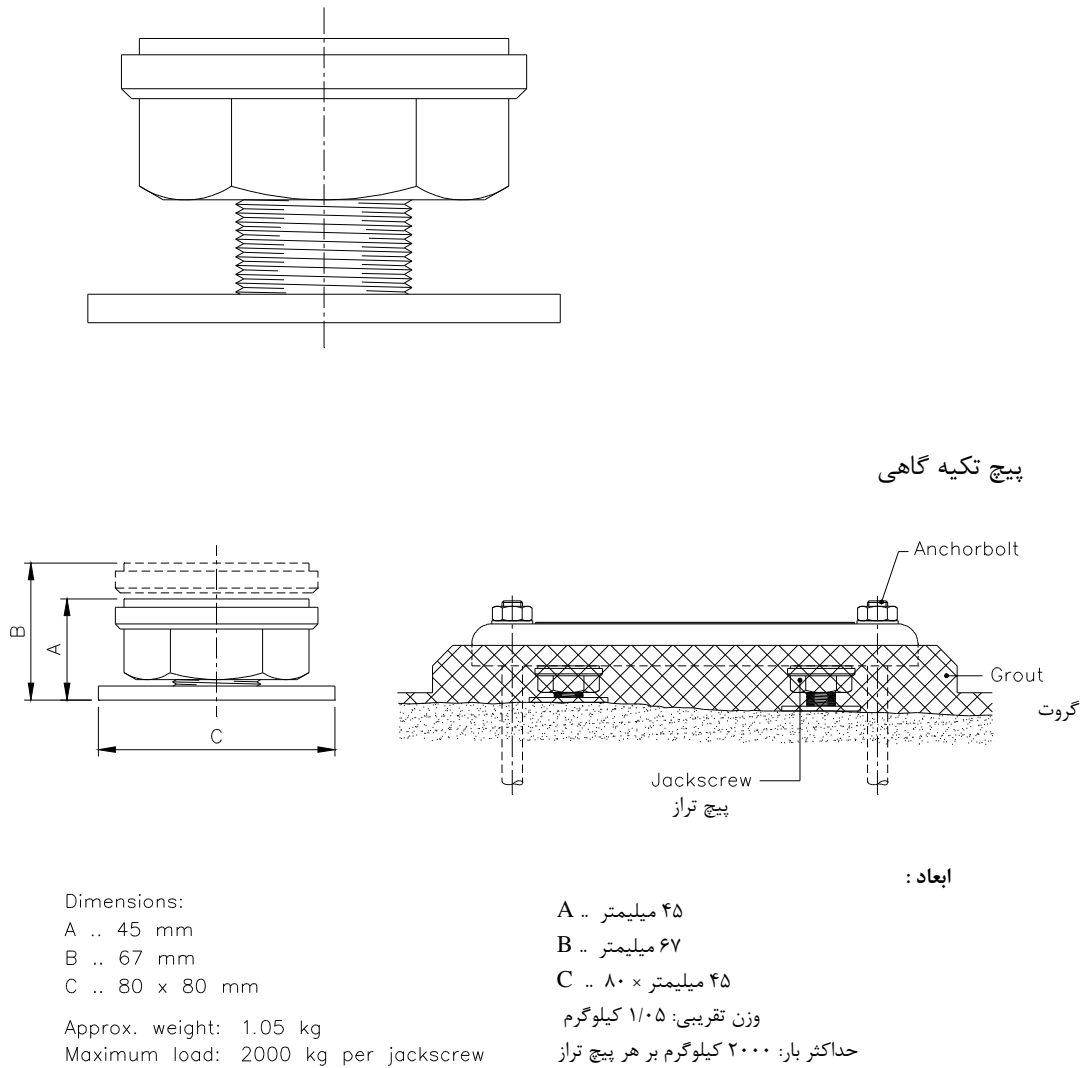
DIMENSIONS AND TYPICAL ARRANGEMENT OF JACKING SCREW (ADD)
